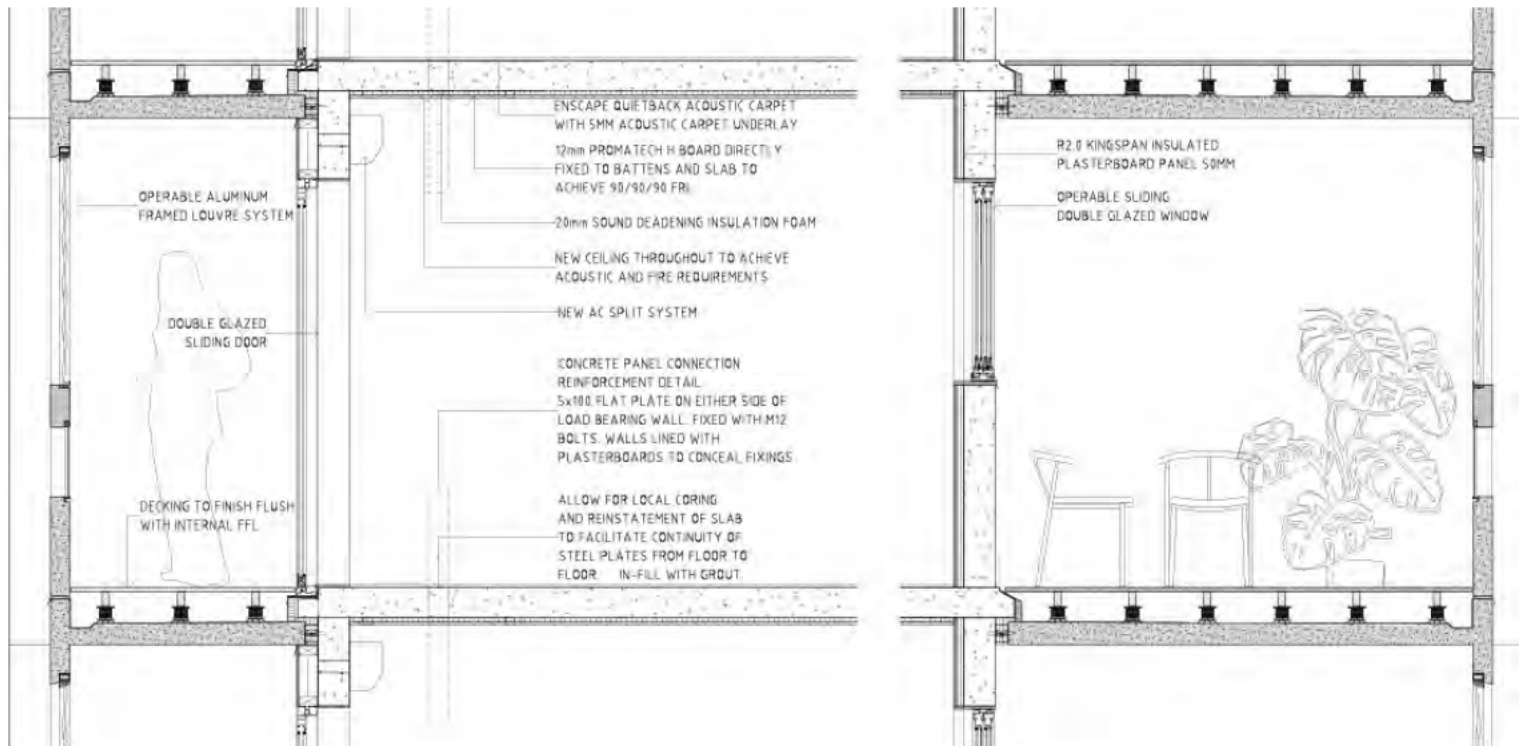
Sectional detail of the new balconies and building fabric upgrades. OFFICE
